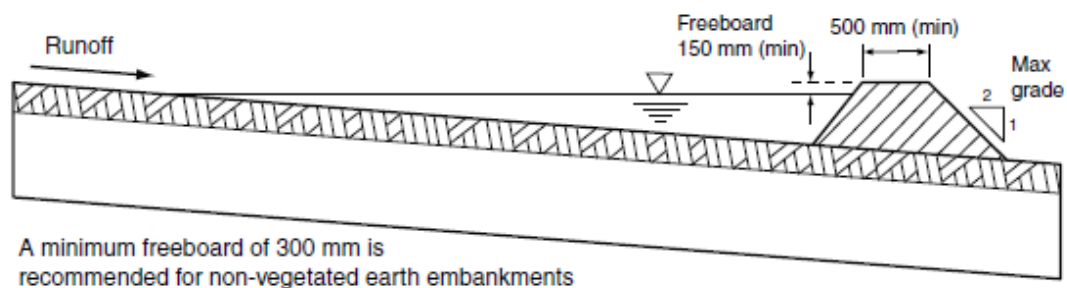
Upslope diverted water configuration – diversion bank (IECA, 2008)
